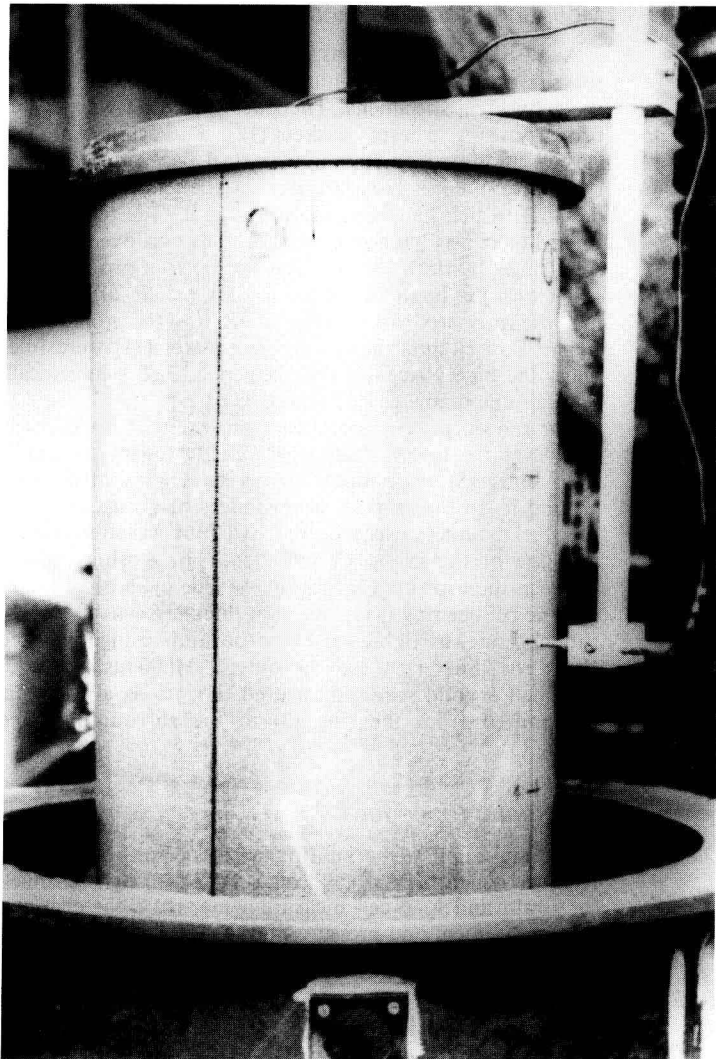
Cylinder I/IV before test showing the geometric-imperfection measurement method
